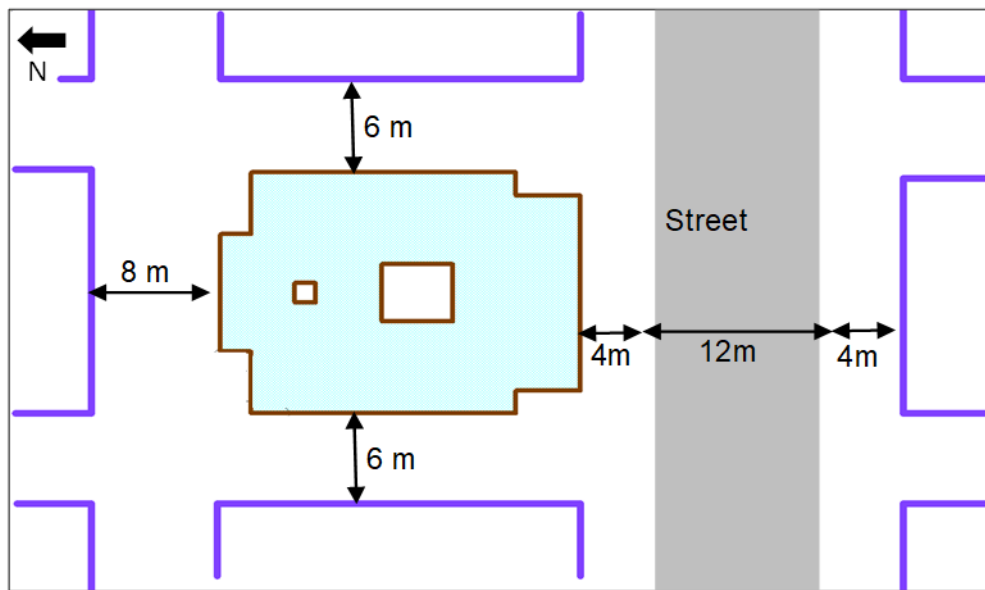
Site plan and the assumed surrounding building modeled in IDA ICE 4.8.
